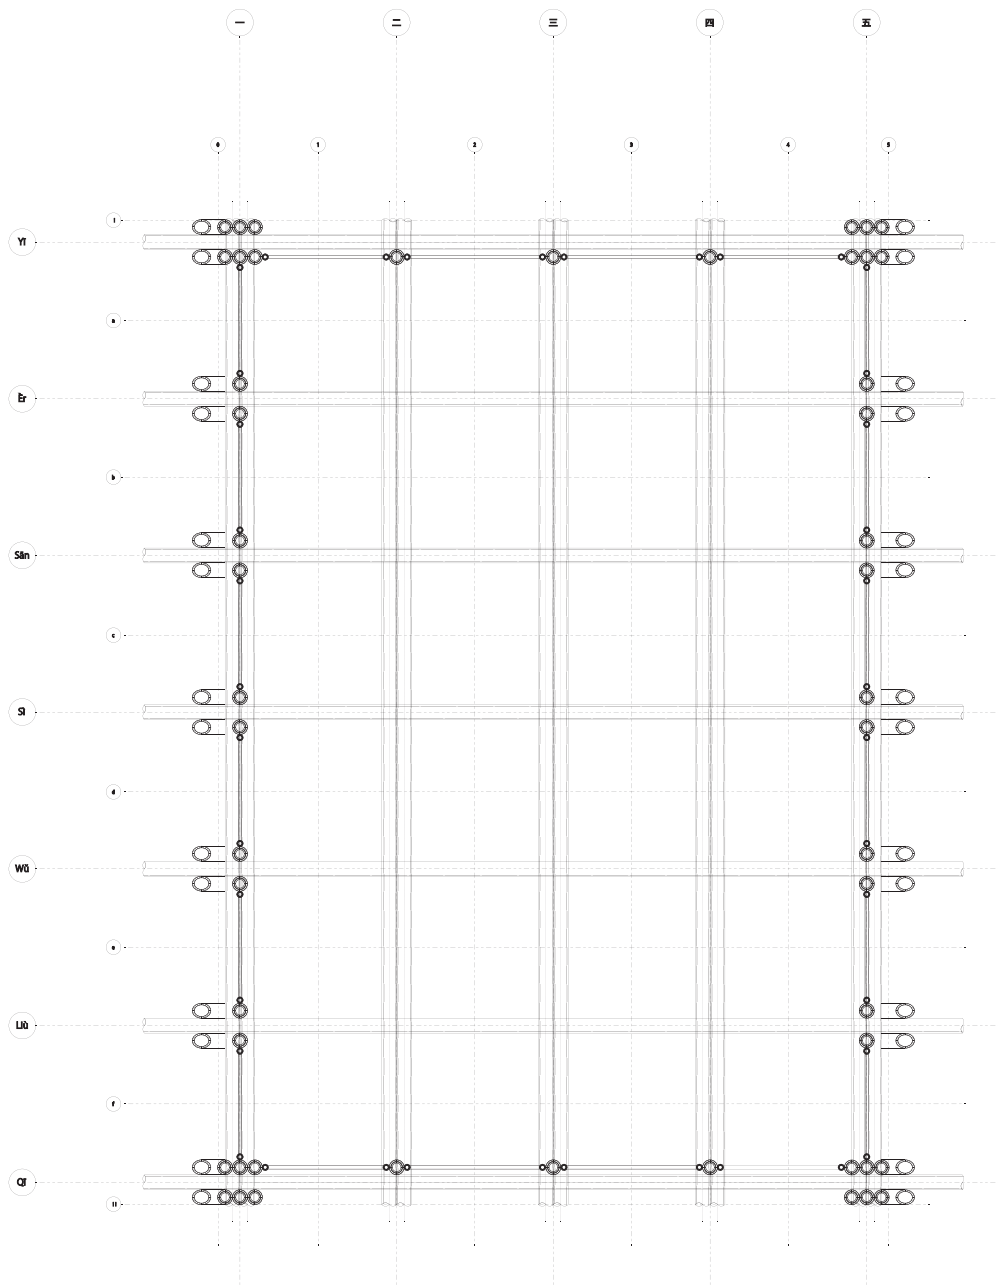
Bamboo Frame Unit Construction - Multiple support structure
